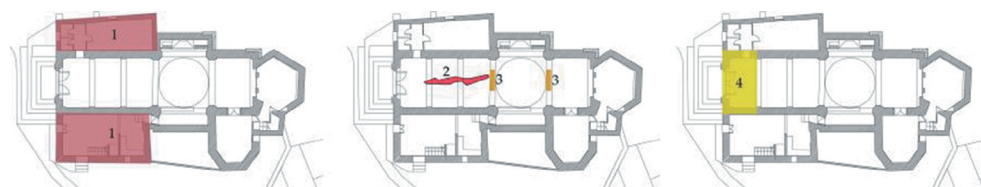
Collapsing process floor plan. 1. Adjoining buildings ruin. 2. Vaults collapse. 3. Damages at toral arches. 4. Choir room collapse.
